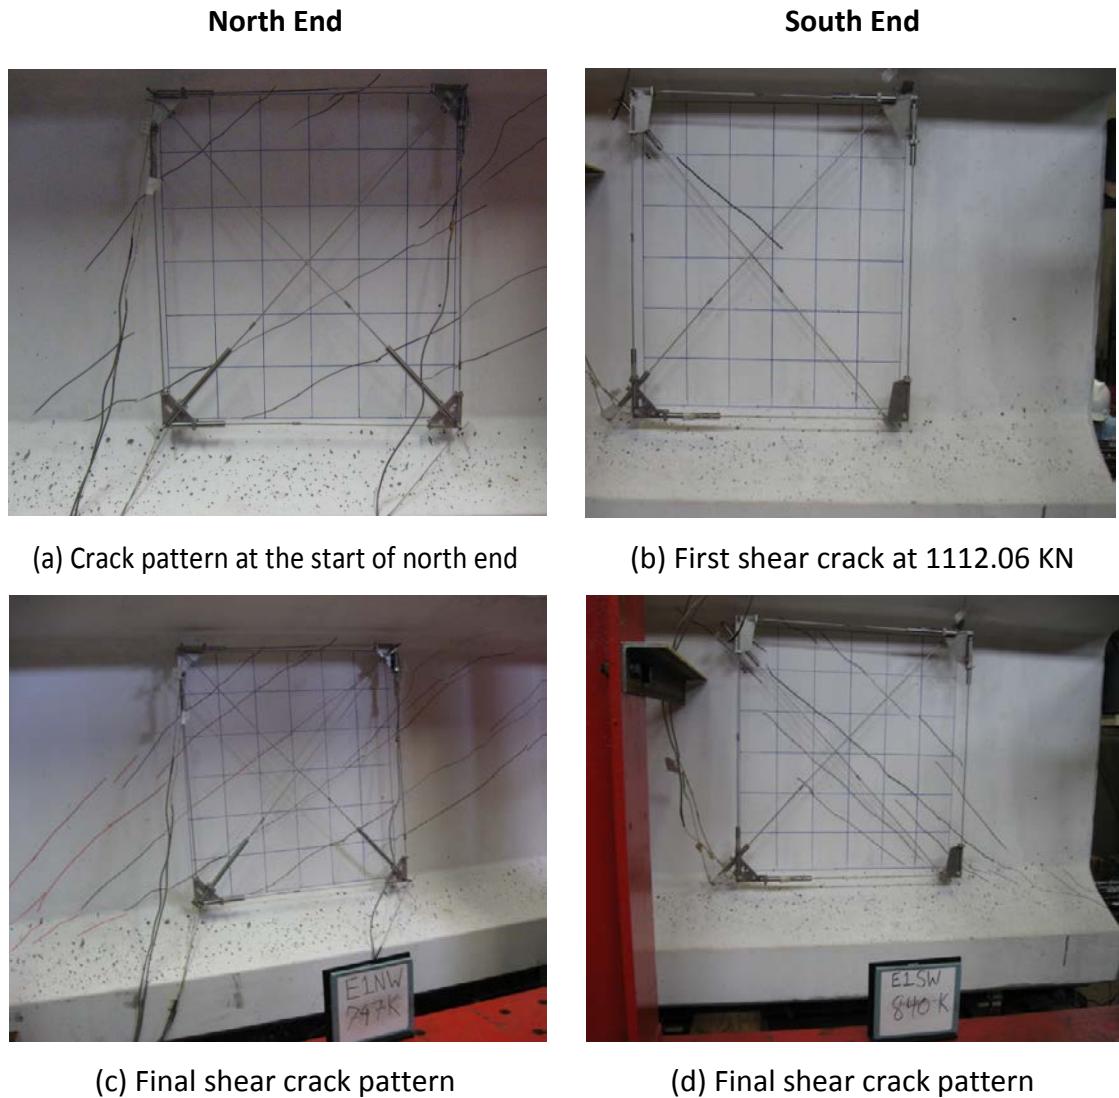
Shear Crack Pattern of Girder E1 (Labib 2012)
